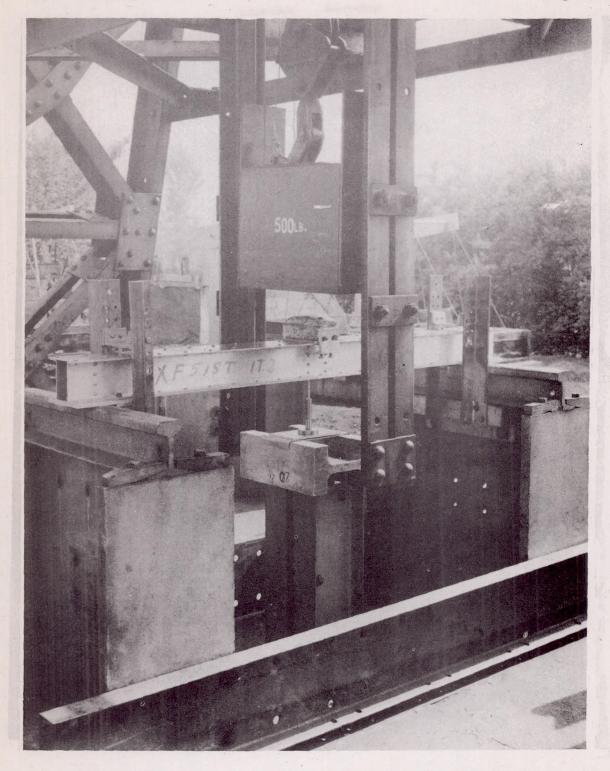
Impact test of riveted girder built up of 618-T sheet 1/8 inch thick.
